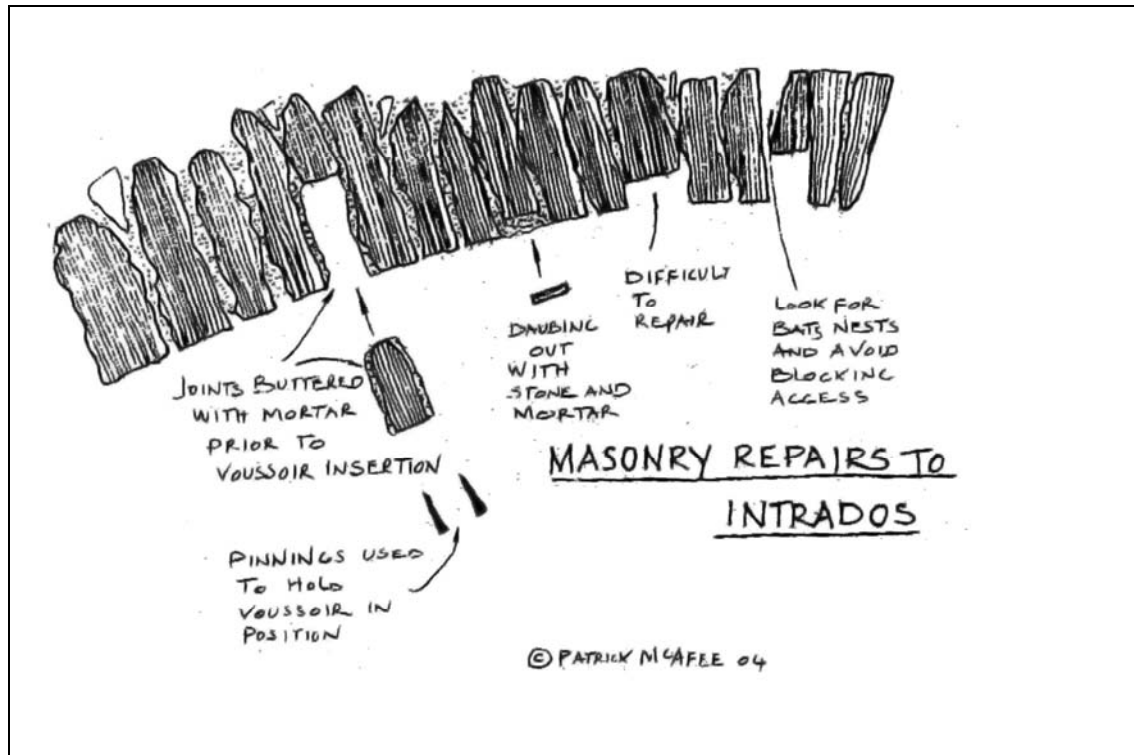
Masonry repairs to bridge intrados (Patrick McAfee)
